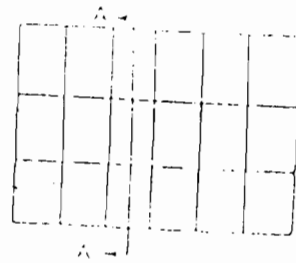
(a) - Typical Framing Plan Of Multistorey Building Composed Of Beams and Column.
